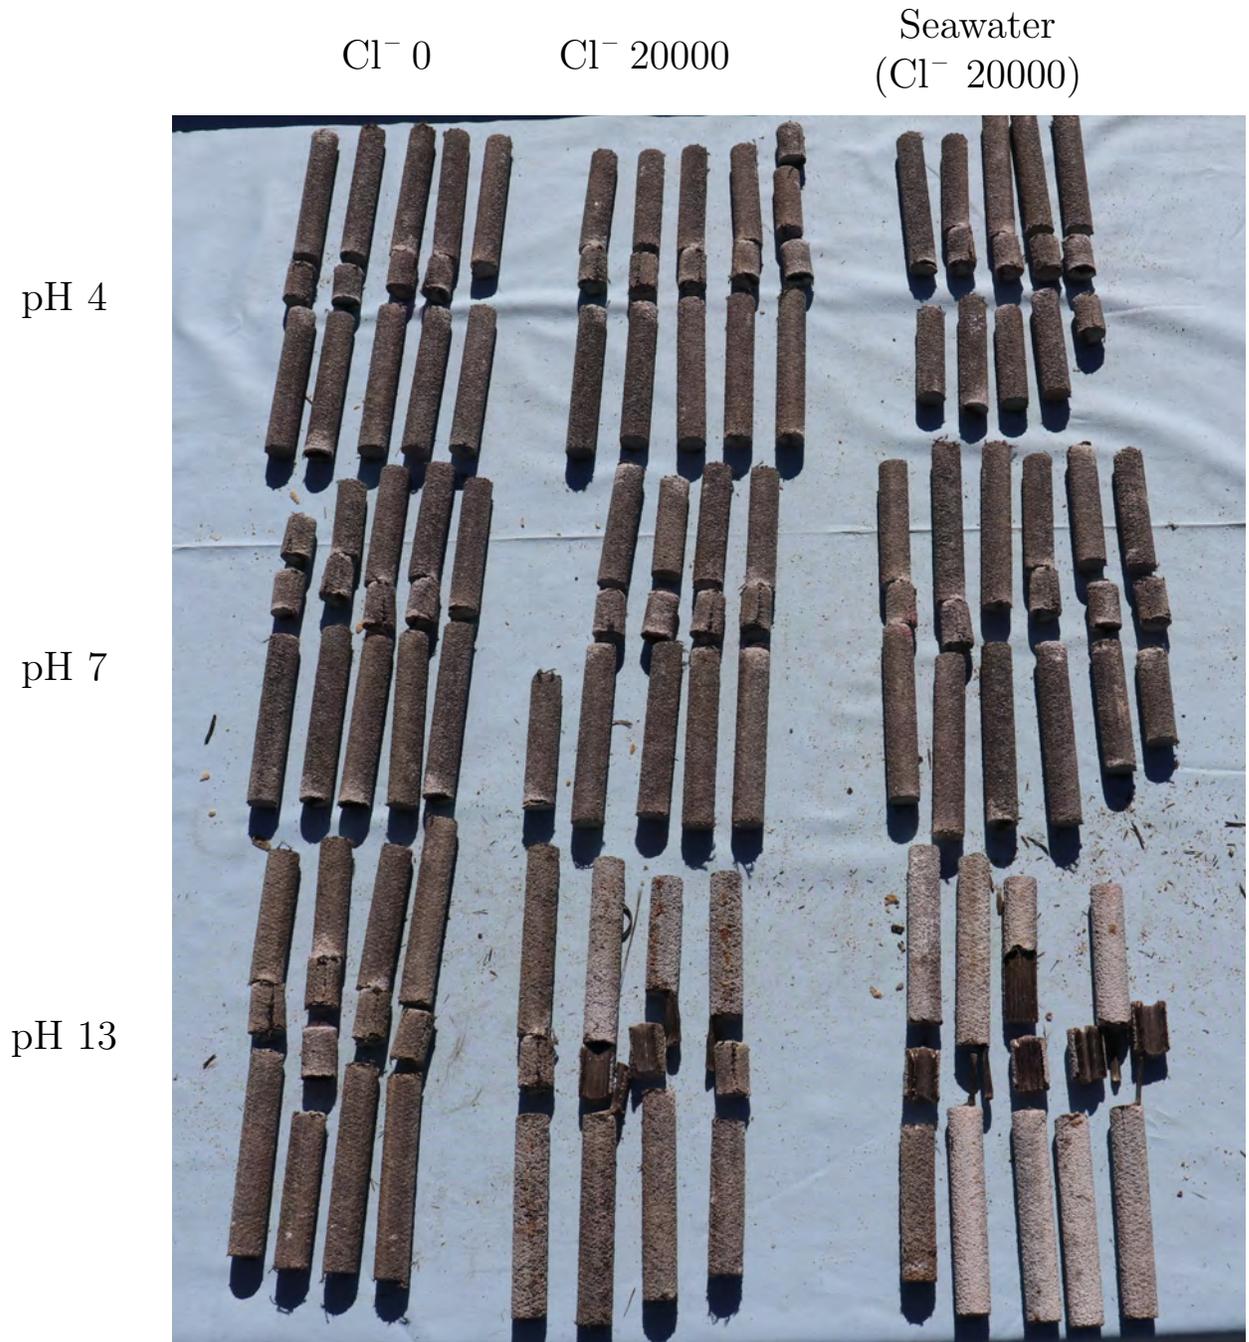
Transverse shear failure mode of Type B #5 rebars
